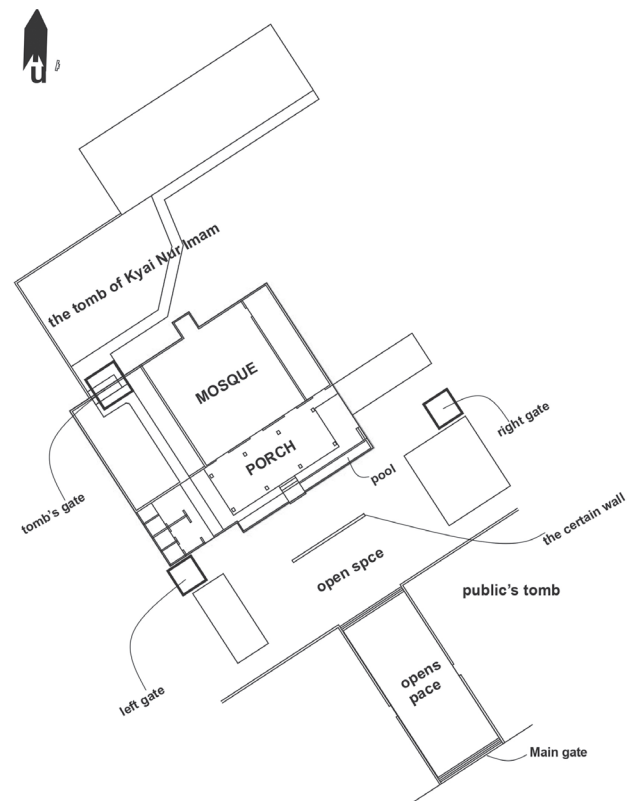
Floor plan picture of Pathok Negoro Mlangi environment
